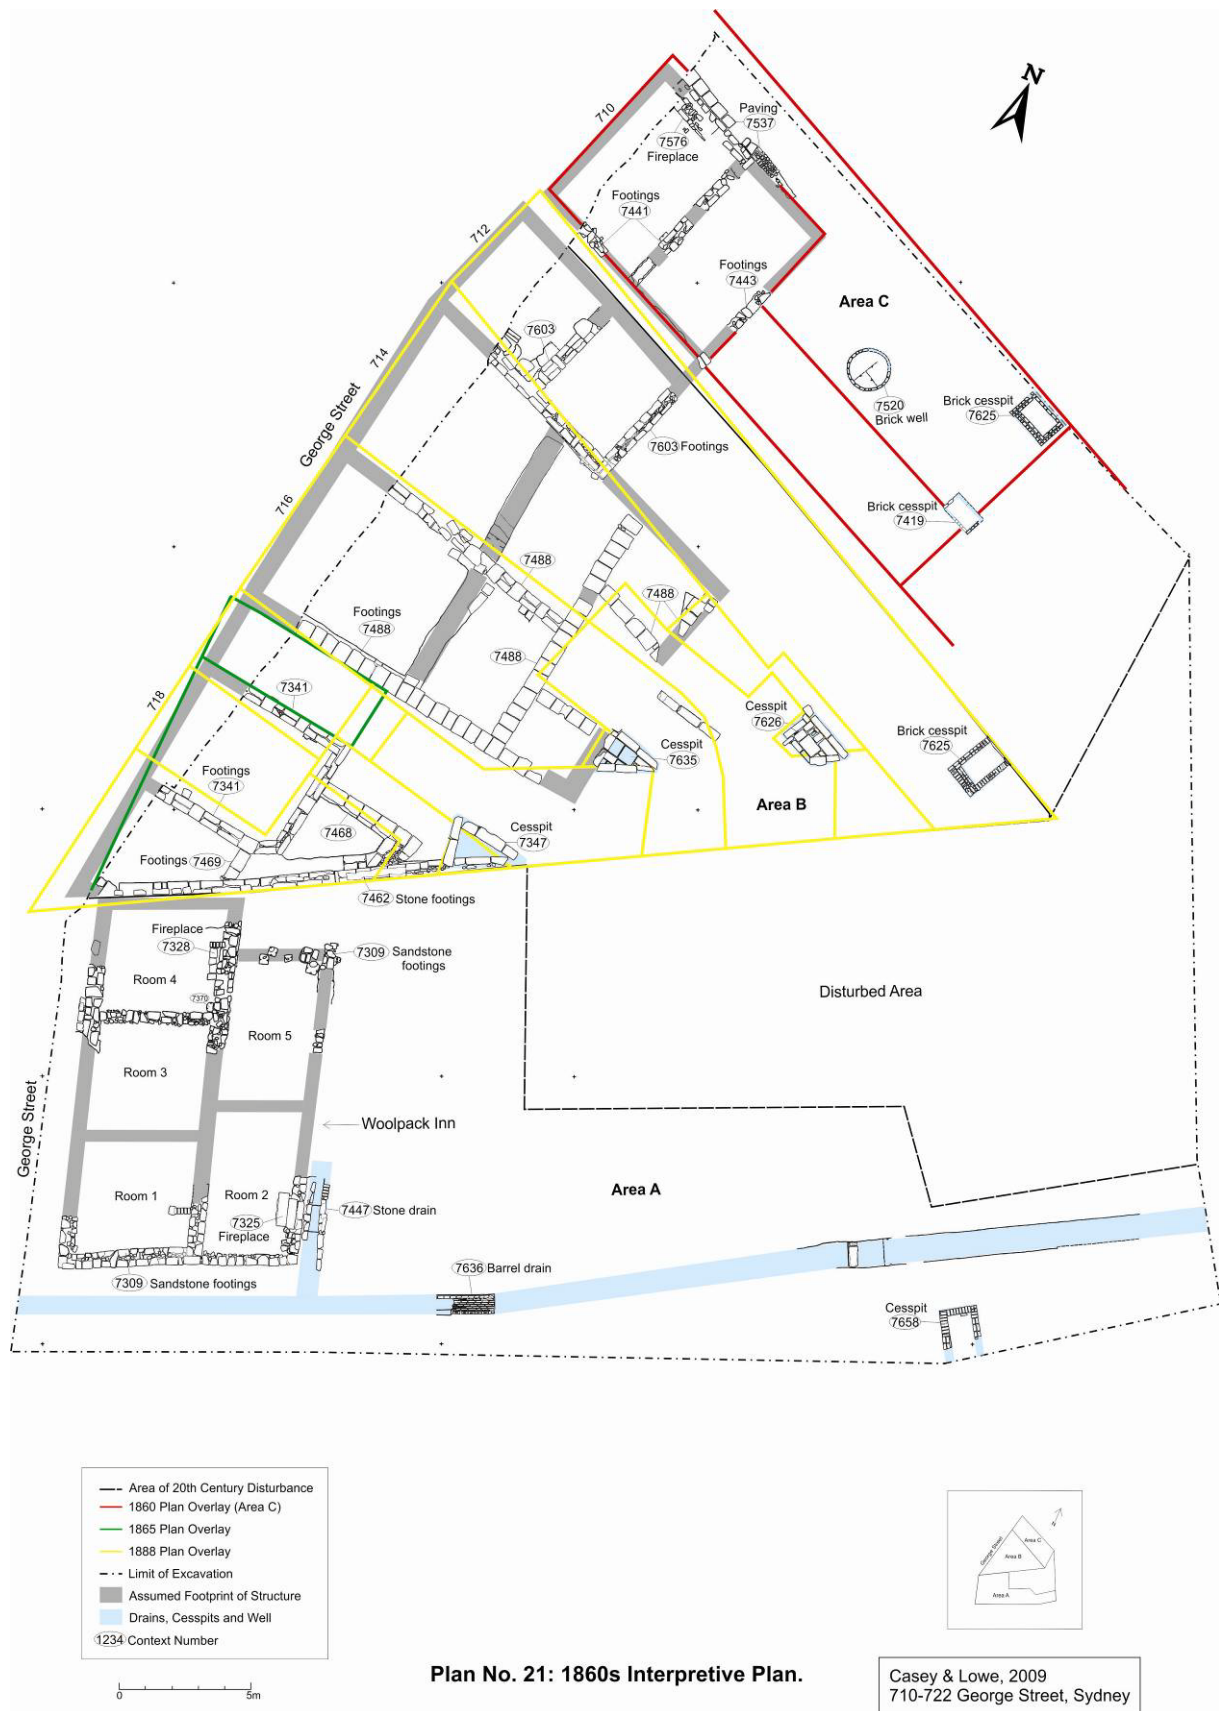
Interpretive plan showing the archaeological remains and projected configurations of buildings in Phase 6. (Plan 21, Section 10).
